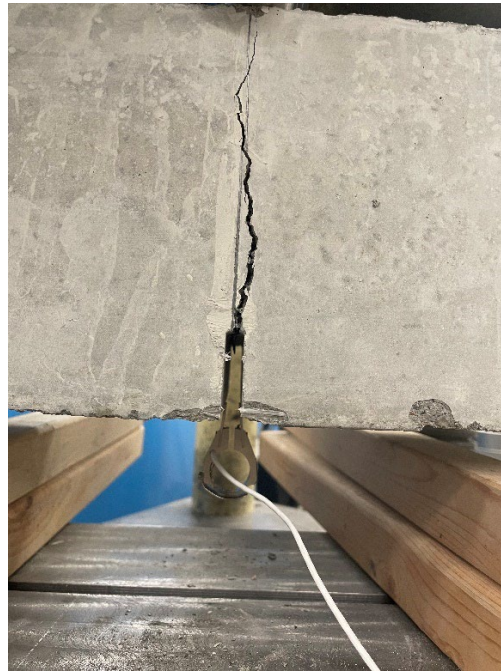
Typical Cracked Mini-Beam with CMOD Transducer
